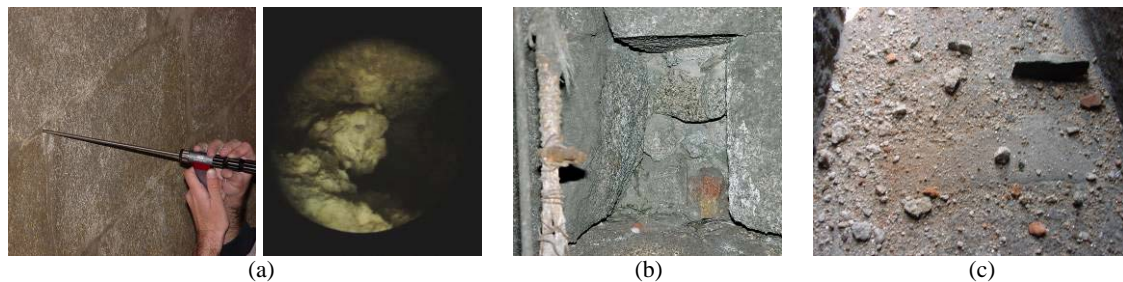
Visual inspection to define the constitution of masonry walls: (a) boroscopic camera, (b) opening up the structure (c) loss of material through central cracks in the openings.
